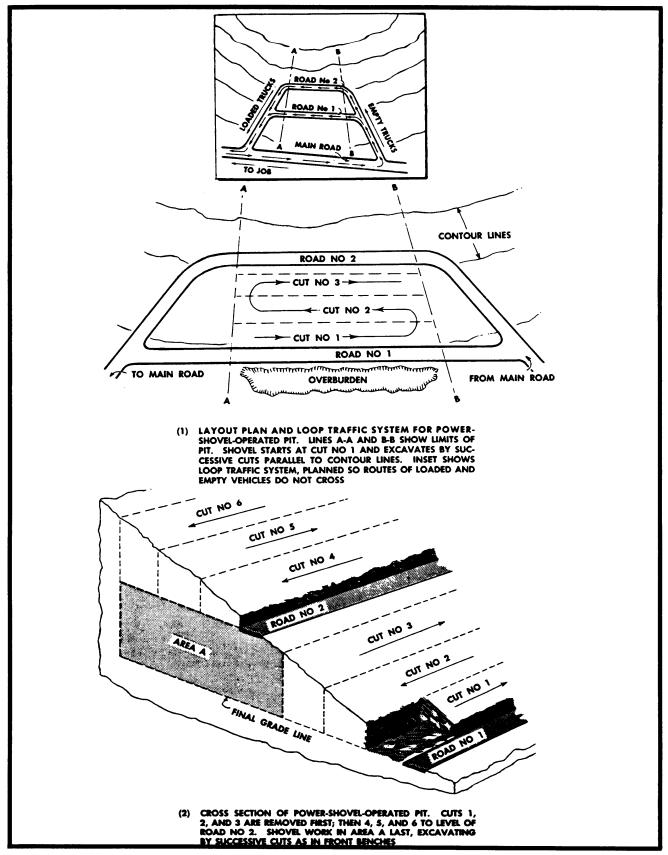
Layout and Cross-section of Hillside Pit Using Power Shovels
